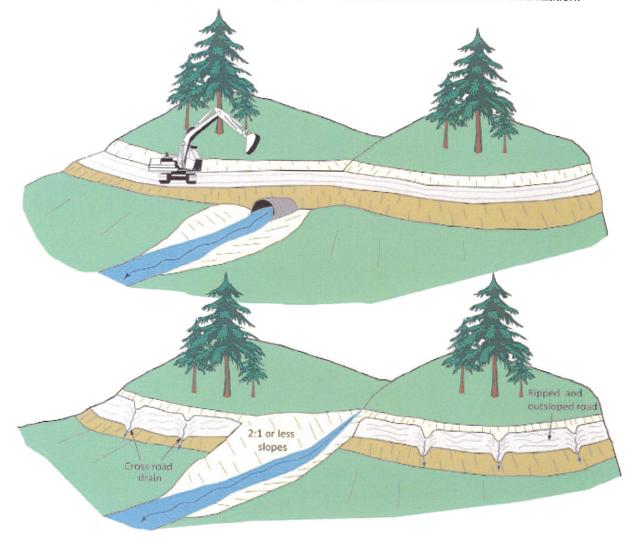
On roads that are to be closed (decommissioned), all stream crossing culverts and fills should be removed. Stream crossing excavations are best performed using an excavator. The original channel should be excavated and exhumed down to the former streambed, with a channel width equal or greater than the natural channel above and below the crossing. Sideslopes should be laid back to a stable angle, typically a 2:1 (50%) gradient, or less. Spoil can be endhauled off-site or stored on the road bench adjacent the crossing, provided it is placed and stabilized where it will not erode or fail and enter the stream.
